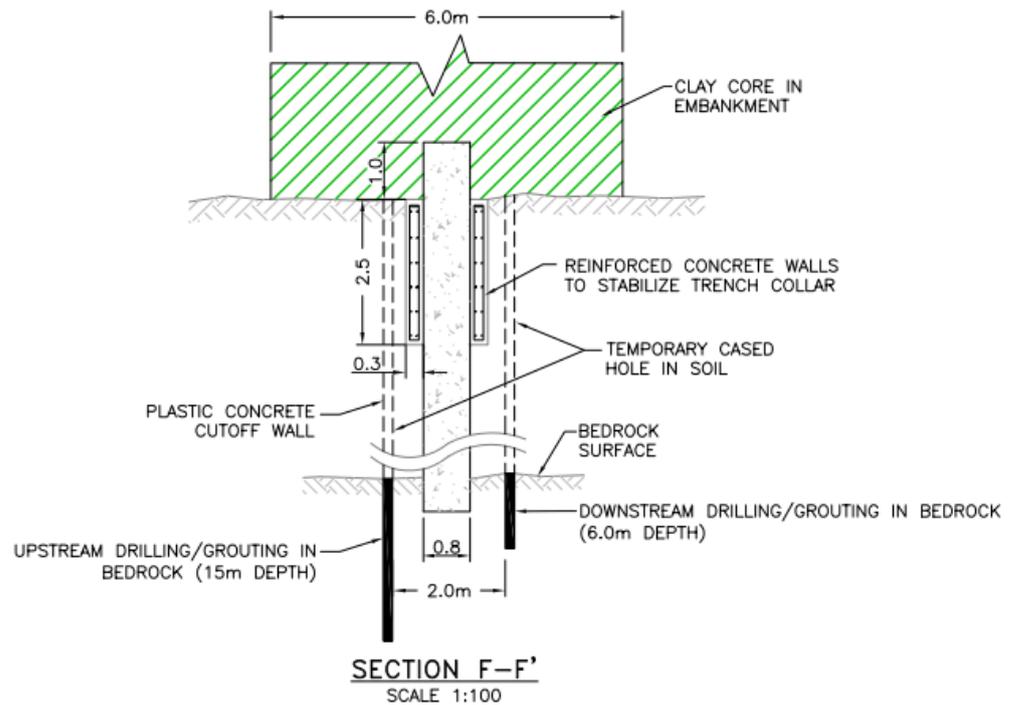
Example of detail of plastic concrete slurry wall with cement–bentonite grout curtain in TSF.
